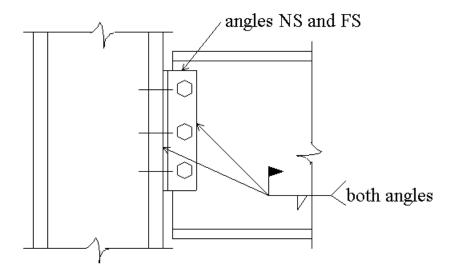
Fillet Weld Reinforcement
